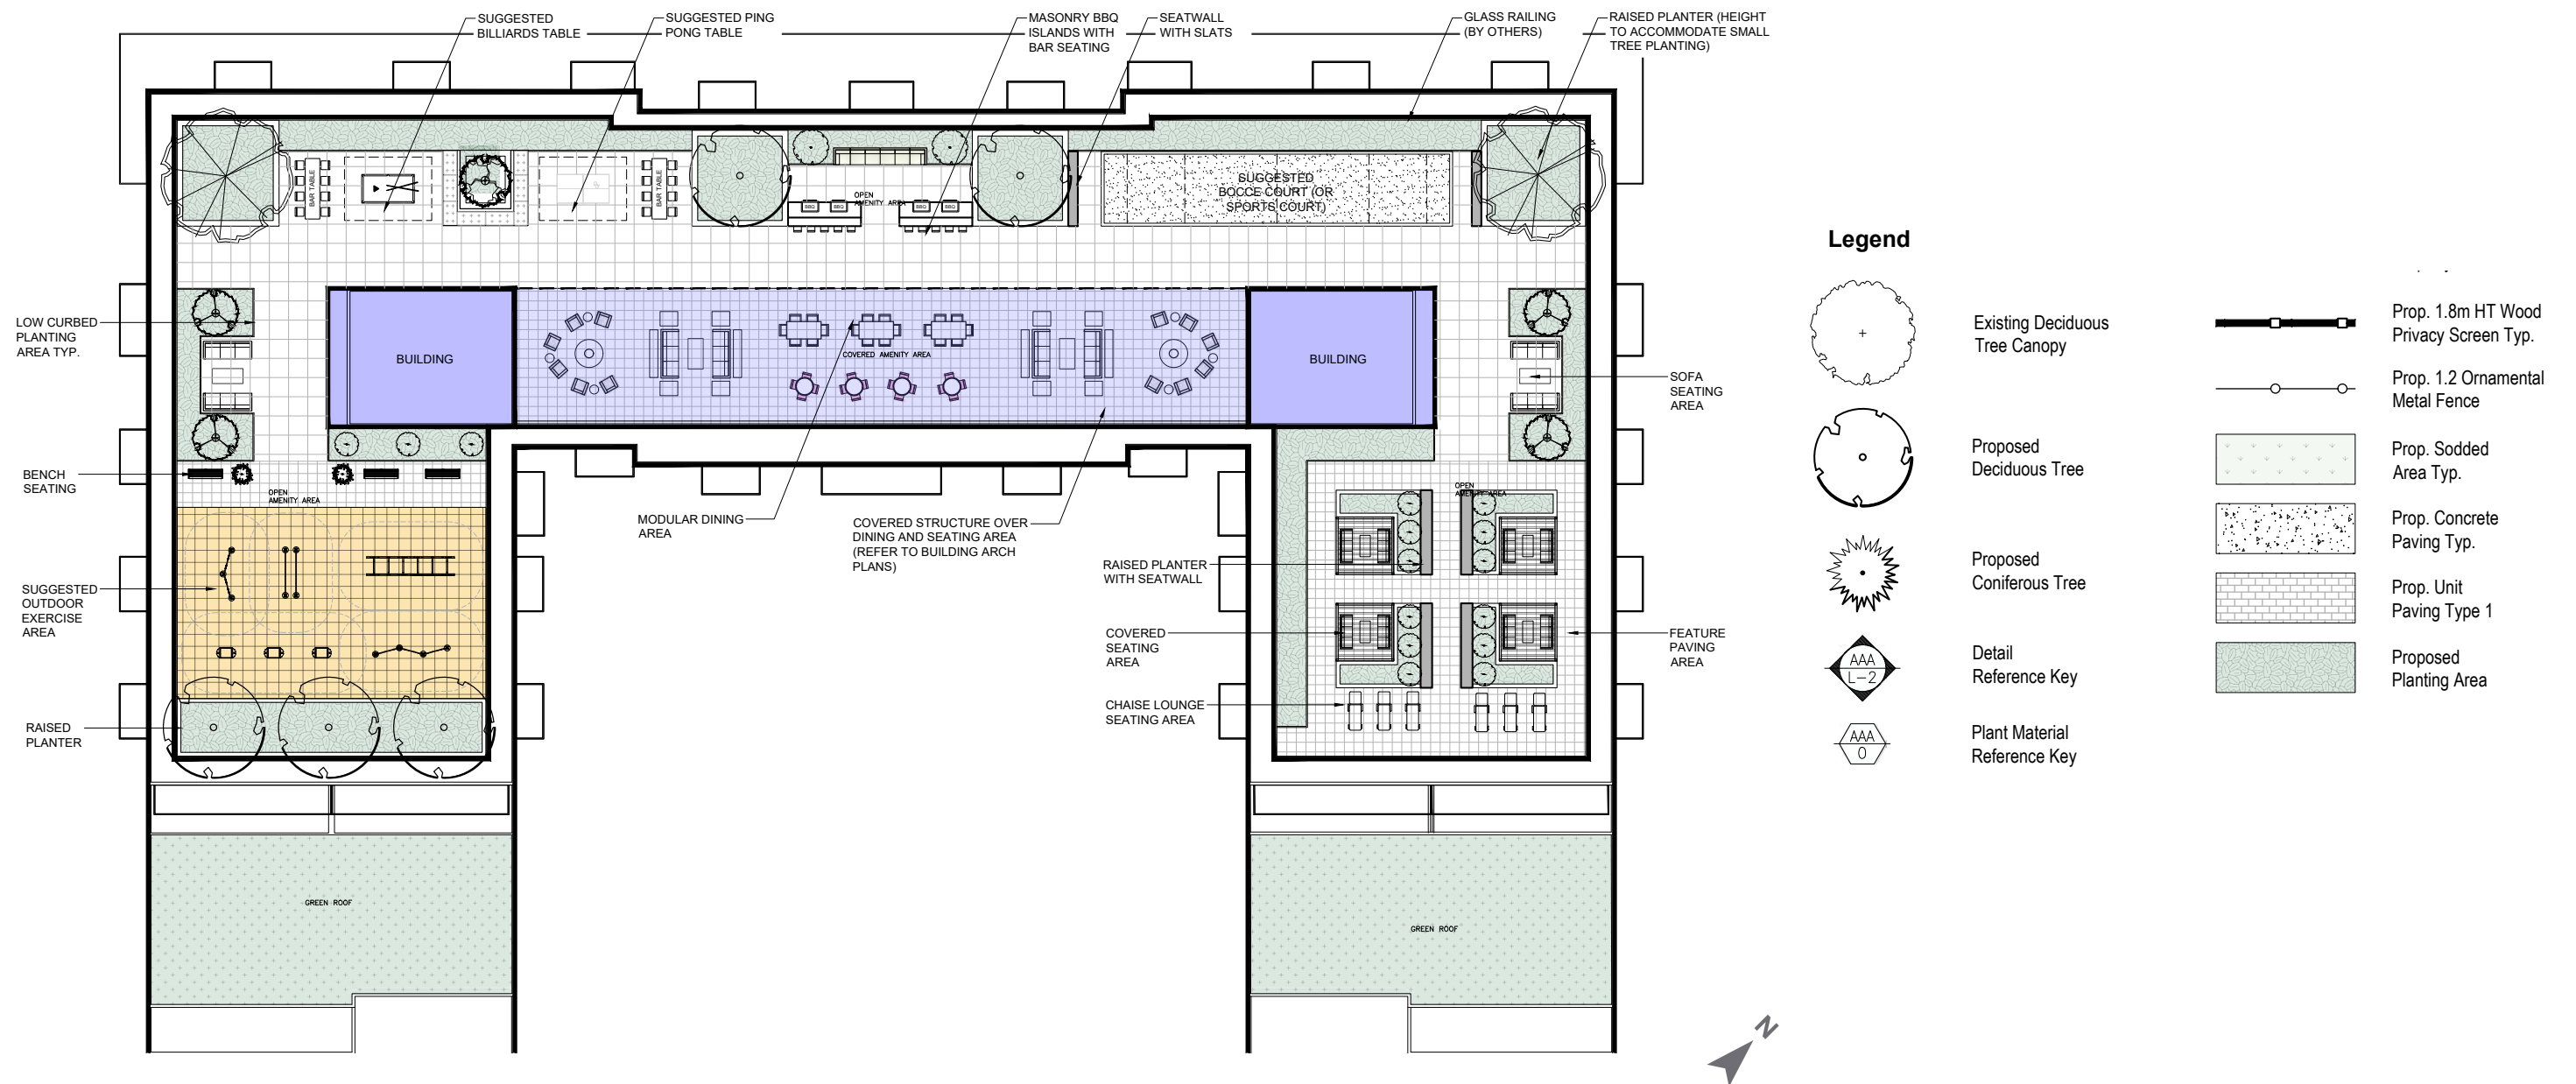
Rooftop Outdoor Amenity Landscape Plan - Prepared by MSLA
